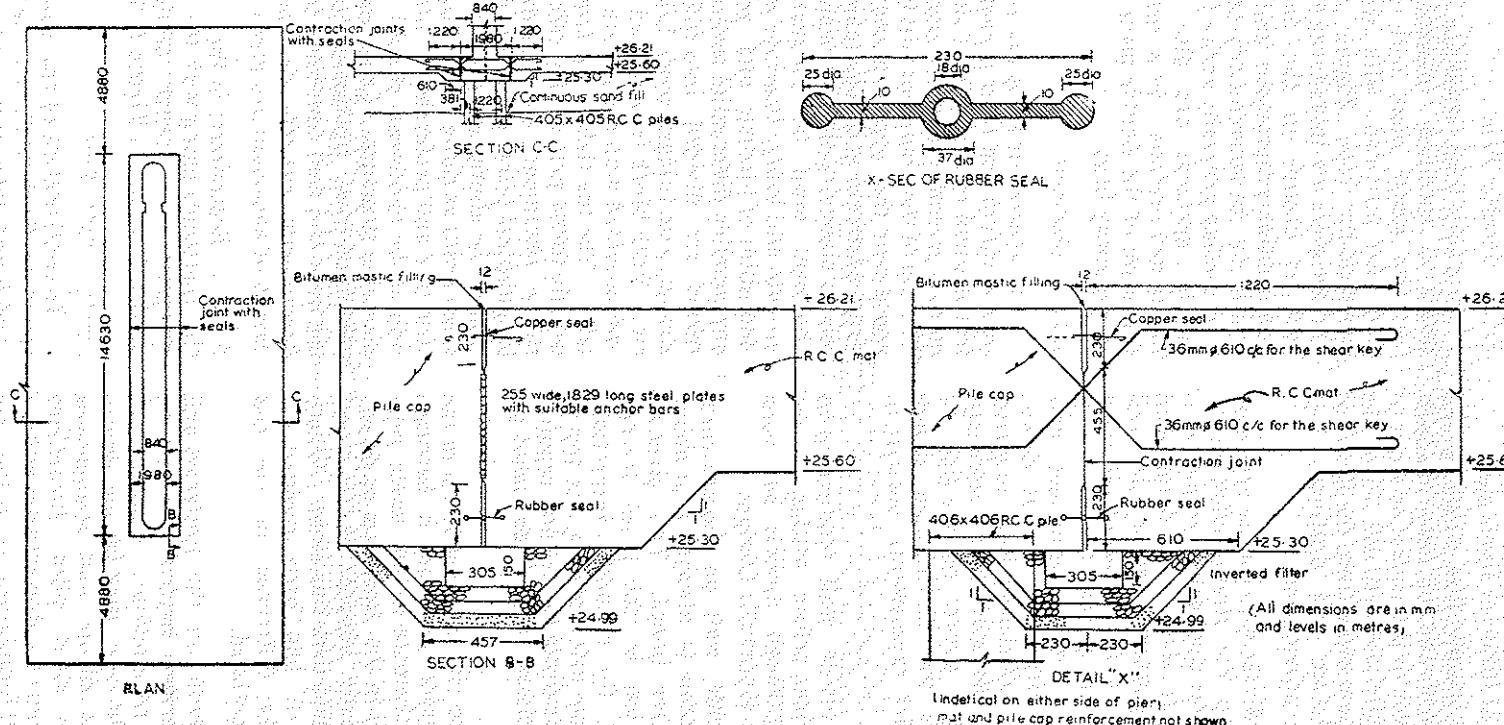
Typical details of Seals Around pier Footings.
